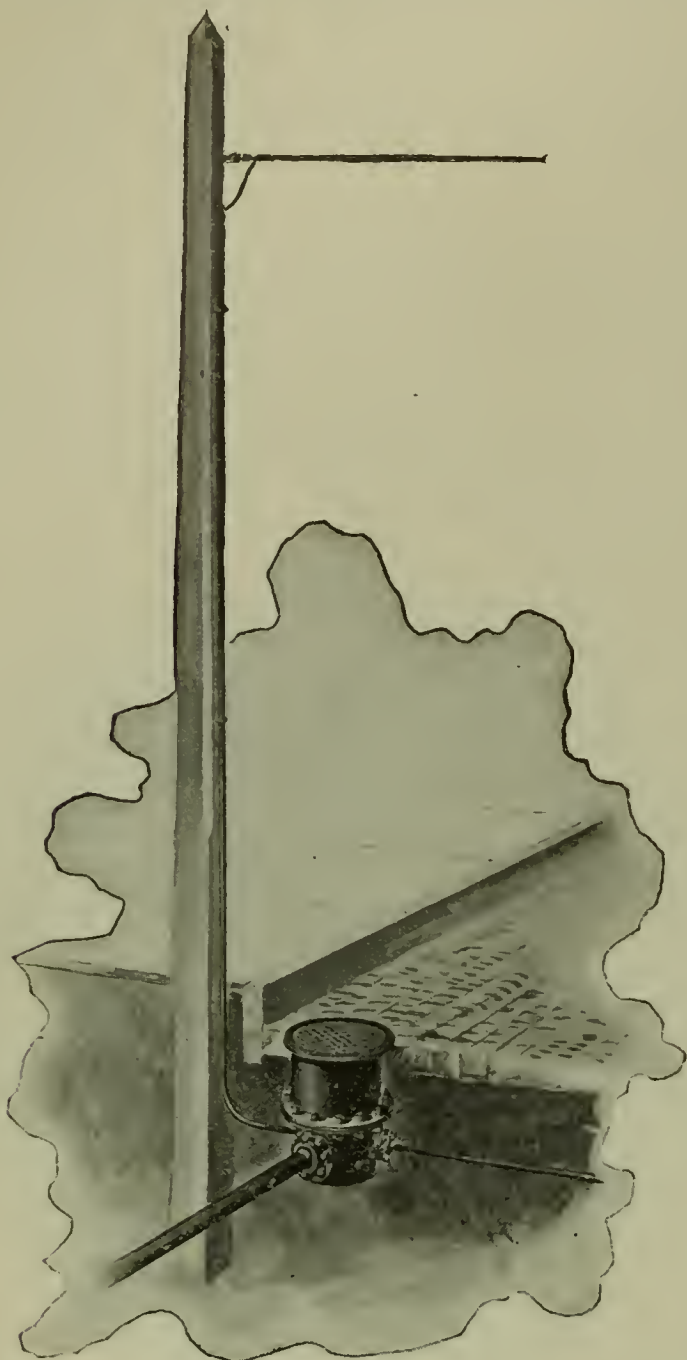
POLE TUBE AND CONNECTION WITH CONDUIT.
